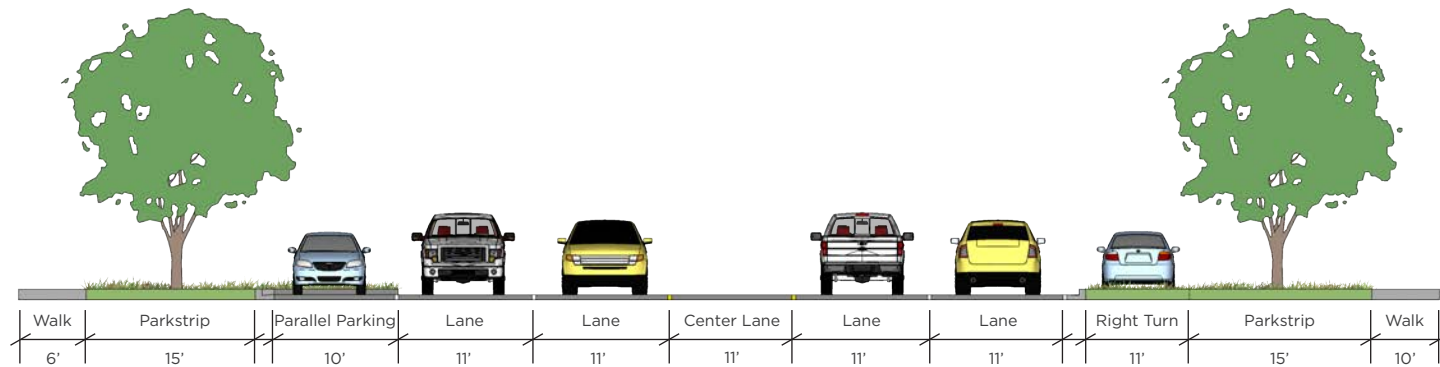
Street cross-section for 500 West at south side of 300 South intersection
